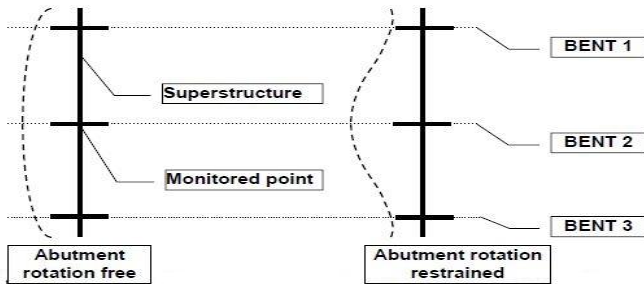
Plan view of the deflection shapes of the superstructure with different abutment restraints
